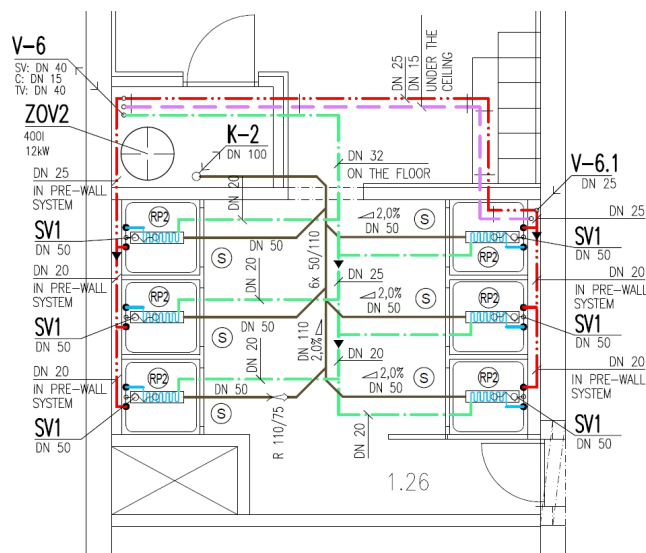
Floor plan with alternative solution of recovery of waste heat using a heat exchanger placed under the shower tray
